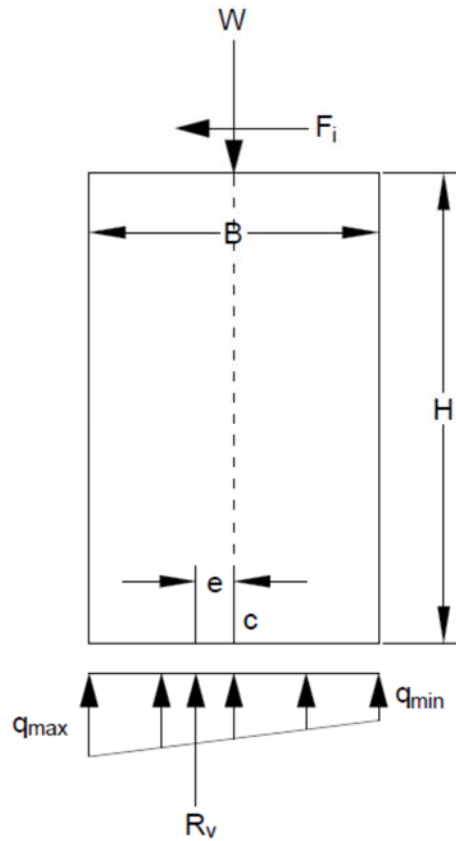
Cross-section of EPS embankment with forces acting on it
